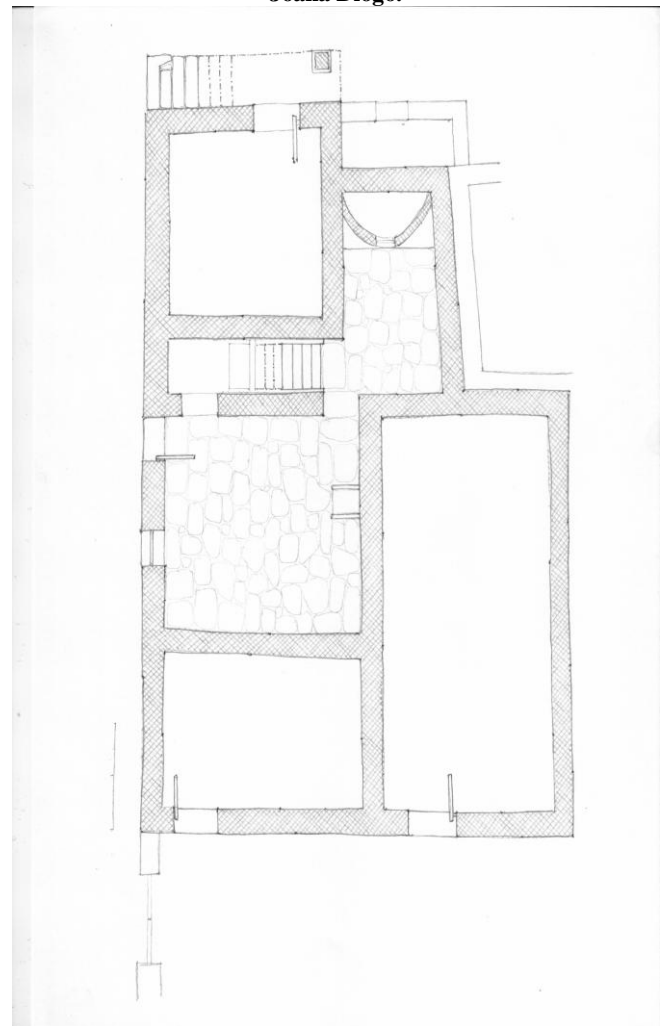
Exemple of a groundfloor house with two floors, drawn by Joana Diogo
